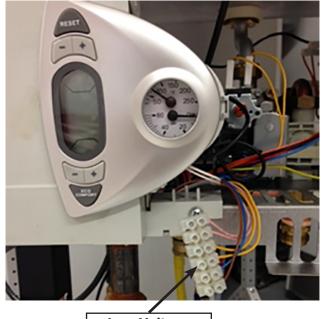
Low Voltage Terminal Strip Removed from Boiler, CHB -130 Shown
